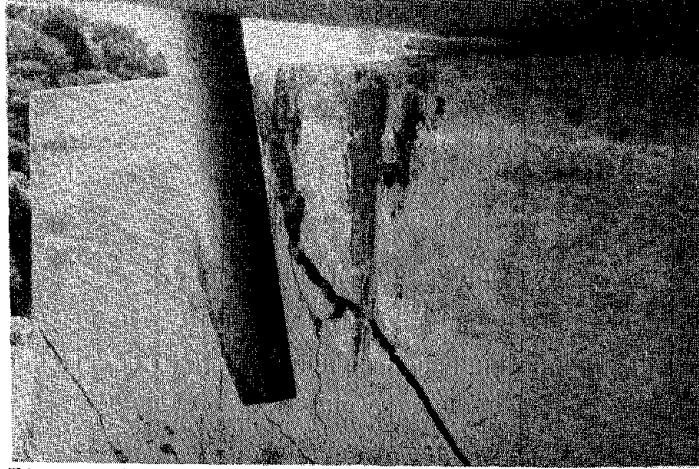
LaAsuncion - West Abutment Wall Damage
